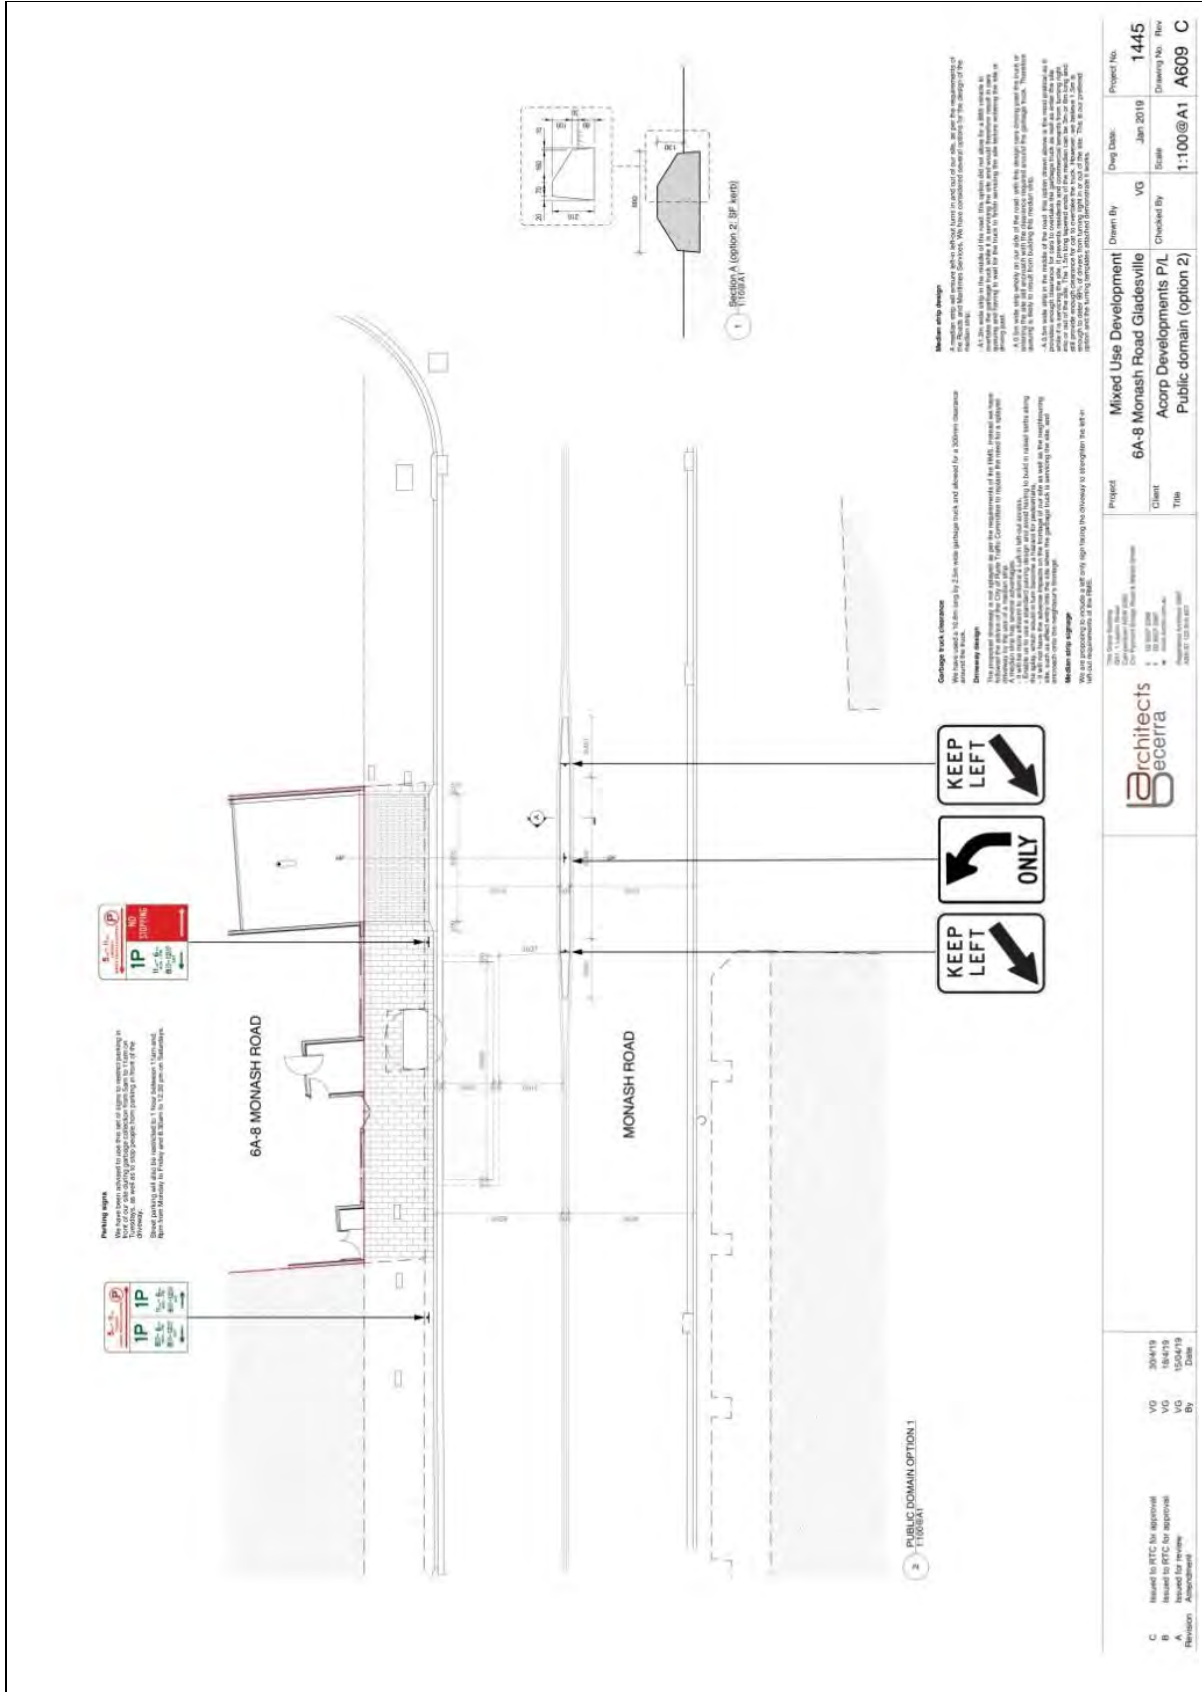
Detailed design of the Proposed Median Strip and the proposed No Parking Zone
